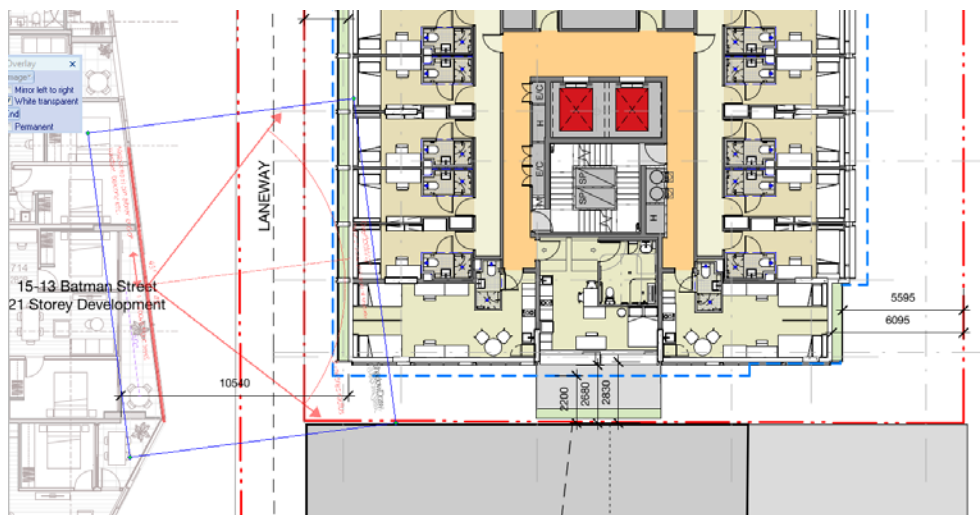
Overlooking diagram. The blue box highlights that the window to the student rooms are located at a distance greater than 9m from the balcony balustrade of the apartments located to the west at 15 – 31 Batman Street.
